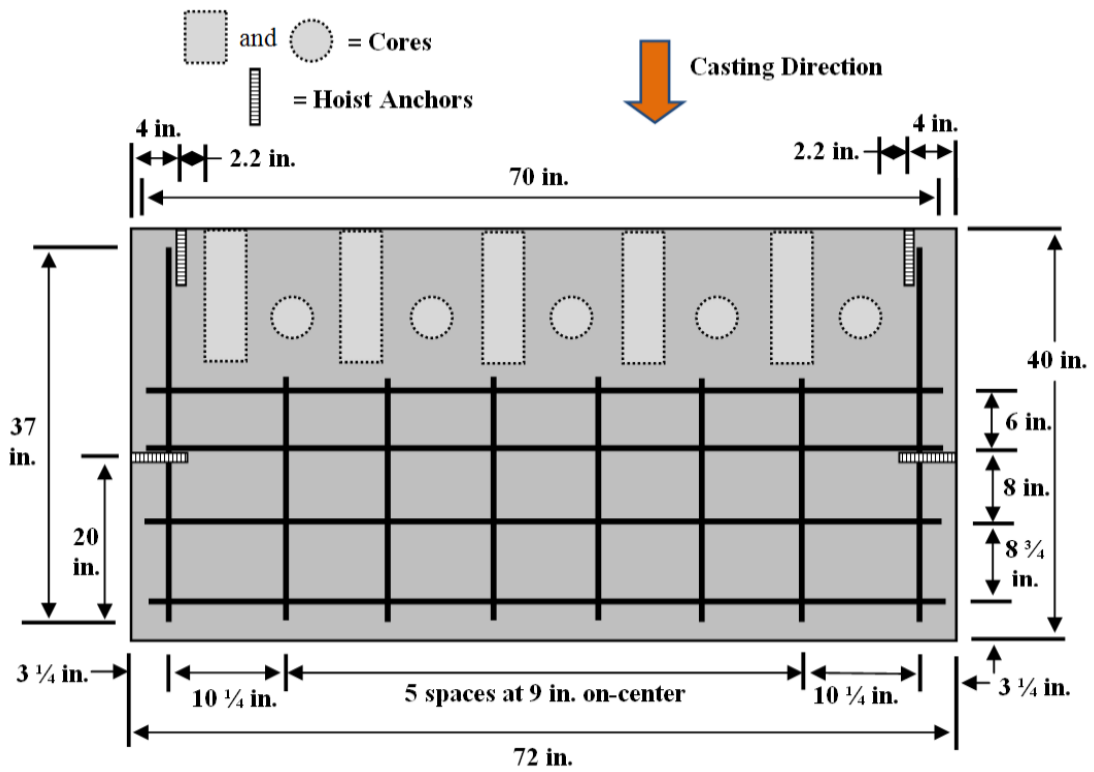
Steel reinforcement layout for wall (elevation view)
